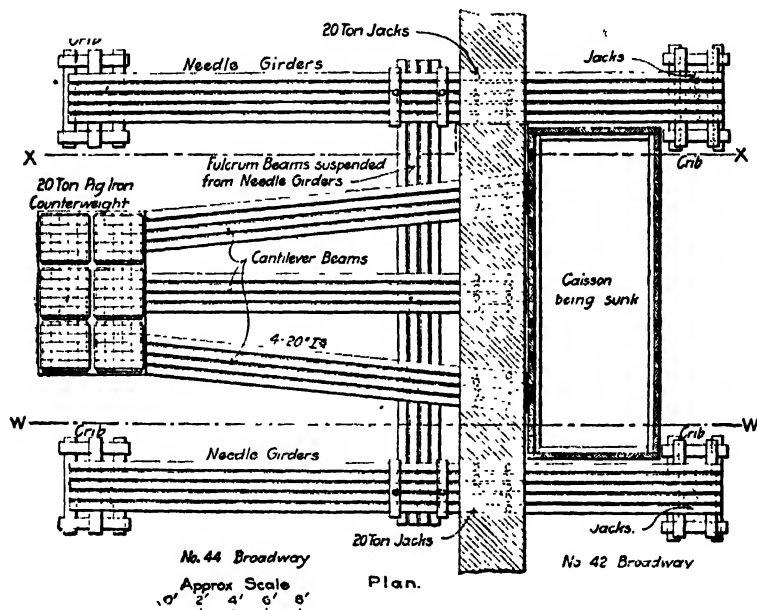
Counterweighted Needle-Beams and Girders for Building at 44 Broadway, New York City.
